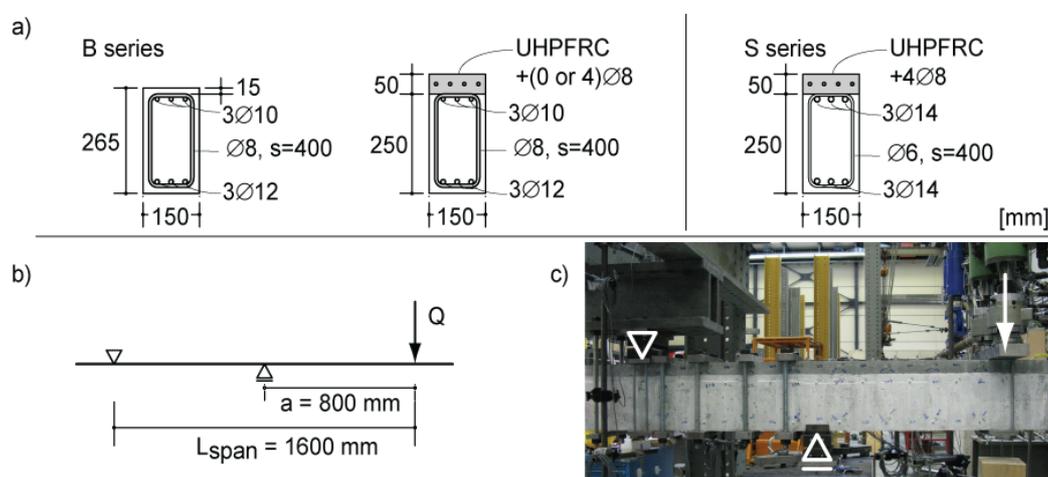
(a) Geometry and reinforcement details; (b) Static system; (c) Test setup
